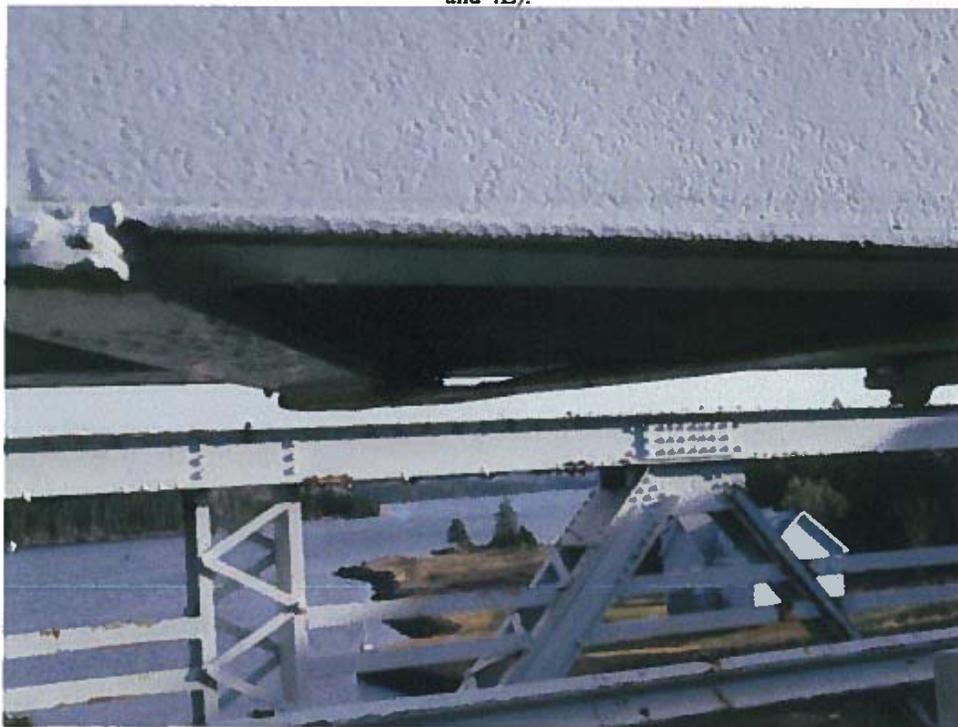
Section loss and perforation at gusset plate (panel point 0) at north truss.
